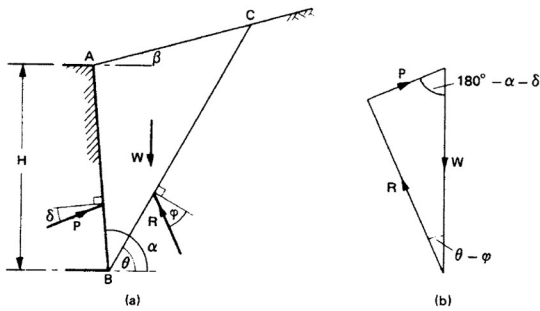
COULOMB EARTH PRESSURE METHOD. A FAILURE PLAN LAYS ON AN ANGLE θ . THE SOIL OVER THE FAILURE PLANE MOVES TOWARD THE WALL. [7]
